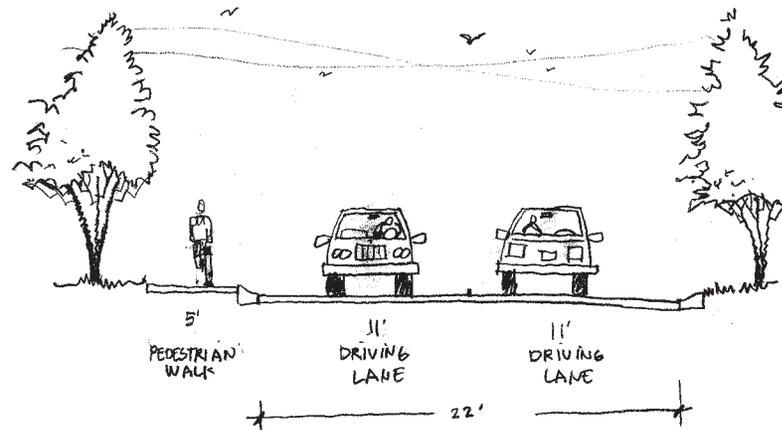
Skyline Parkway 22-foot roadway section. A curb-separated sidewalk could be added to replace the current shoulder.
